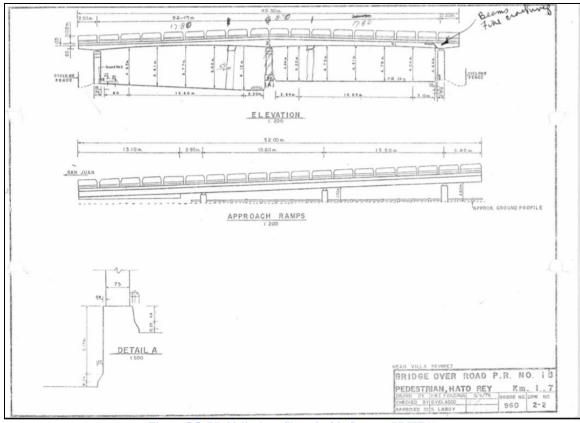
PB 0960 plans Sheet 2 of 2 (Source: PRHTA)
